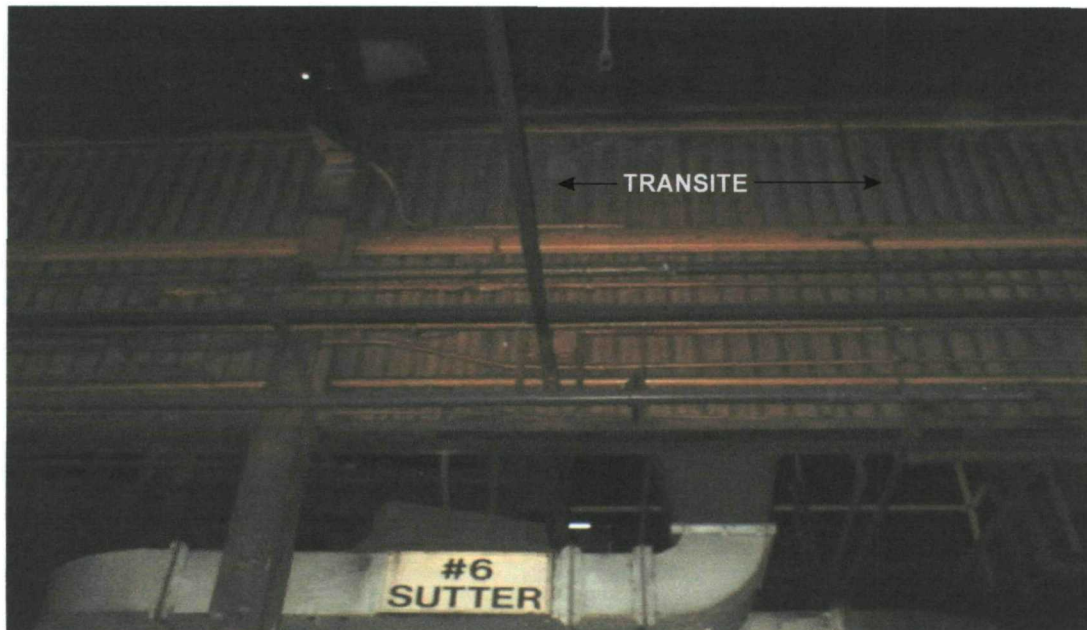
Observed Transite Board, an Asbestos Containing Building Material (ACBM), in the Core Room Area. Refer to Figure 2.
